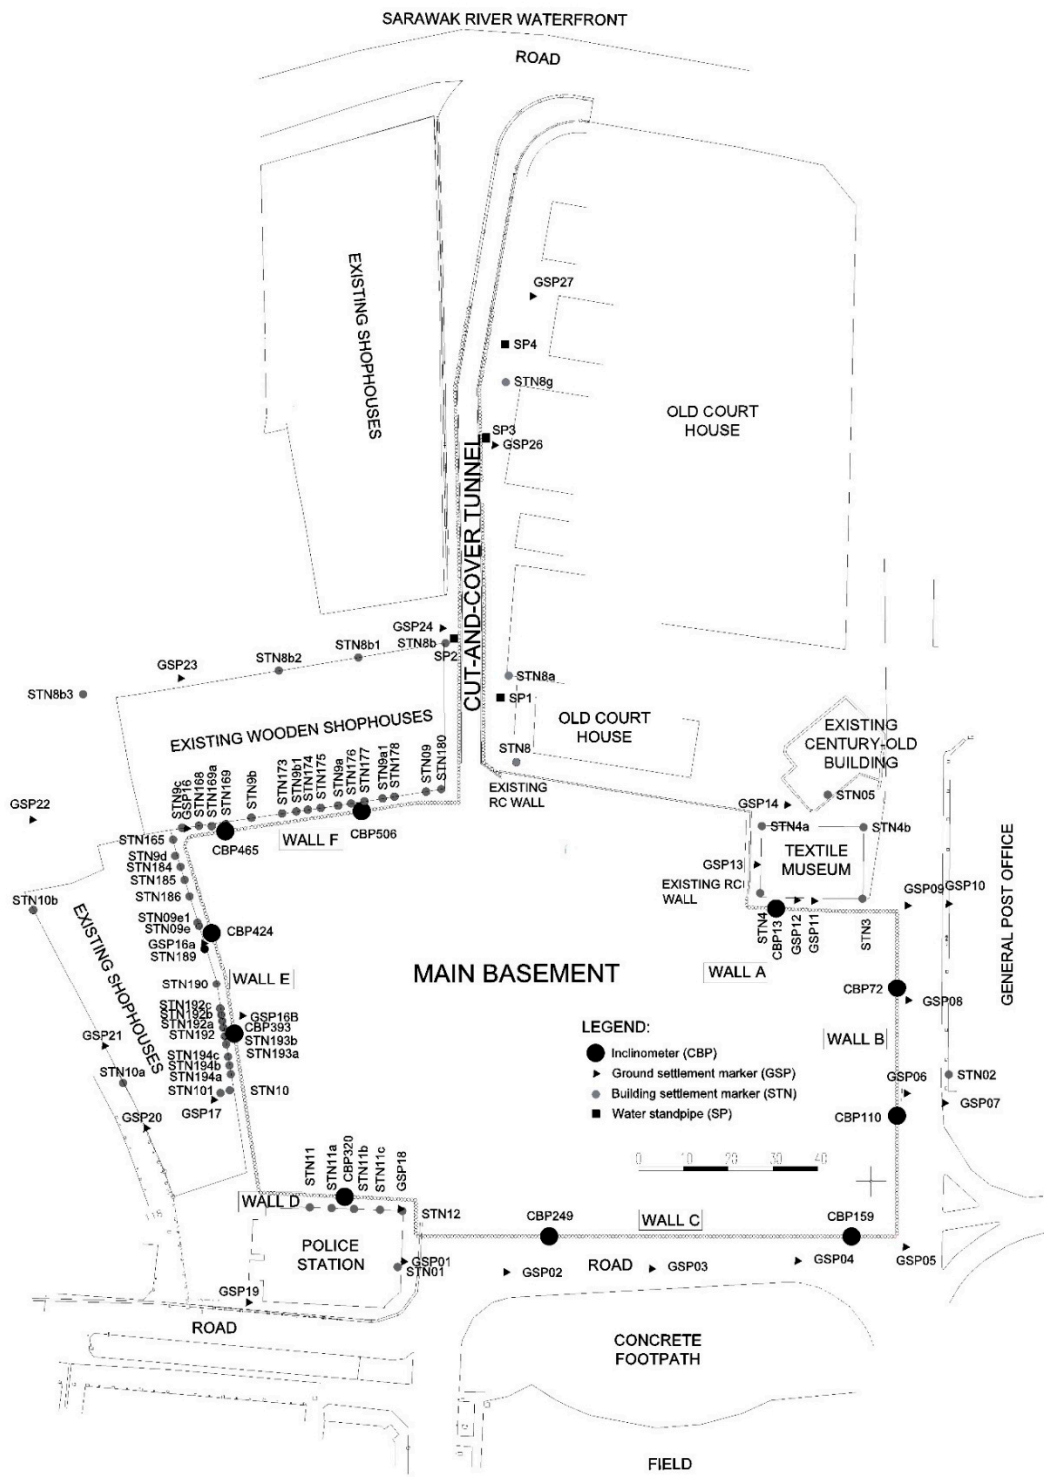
Site layout plan of the main basement and cut-and-cover tunnel with geotechnical instrumentation.
